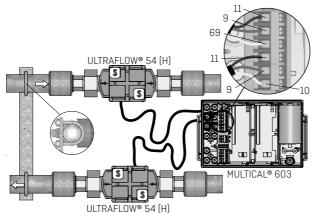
Forward and return pipes are closely electrically coupled. No welded joints occur.
